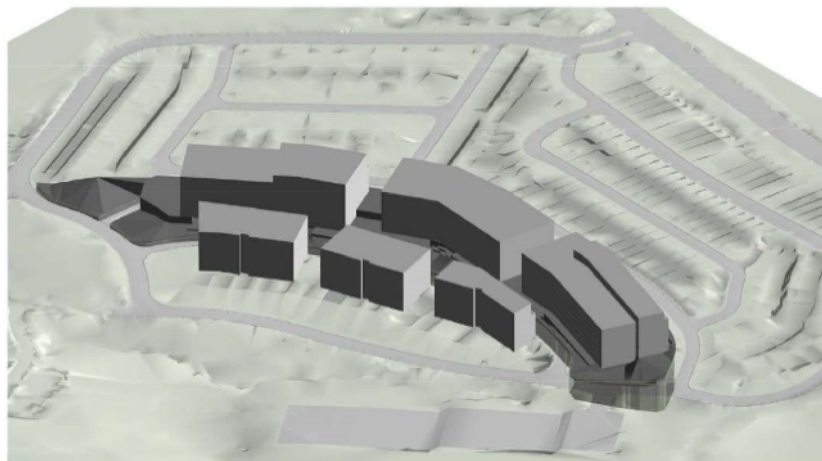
An alternate scheme showing bulk and scale of six (6) apartment buildings within the 22m height standard (Source: Mirvac Design)
